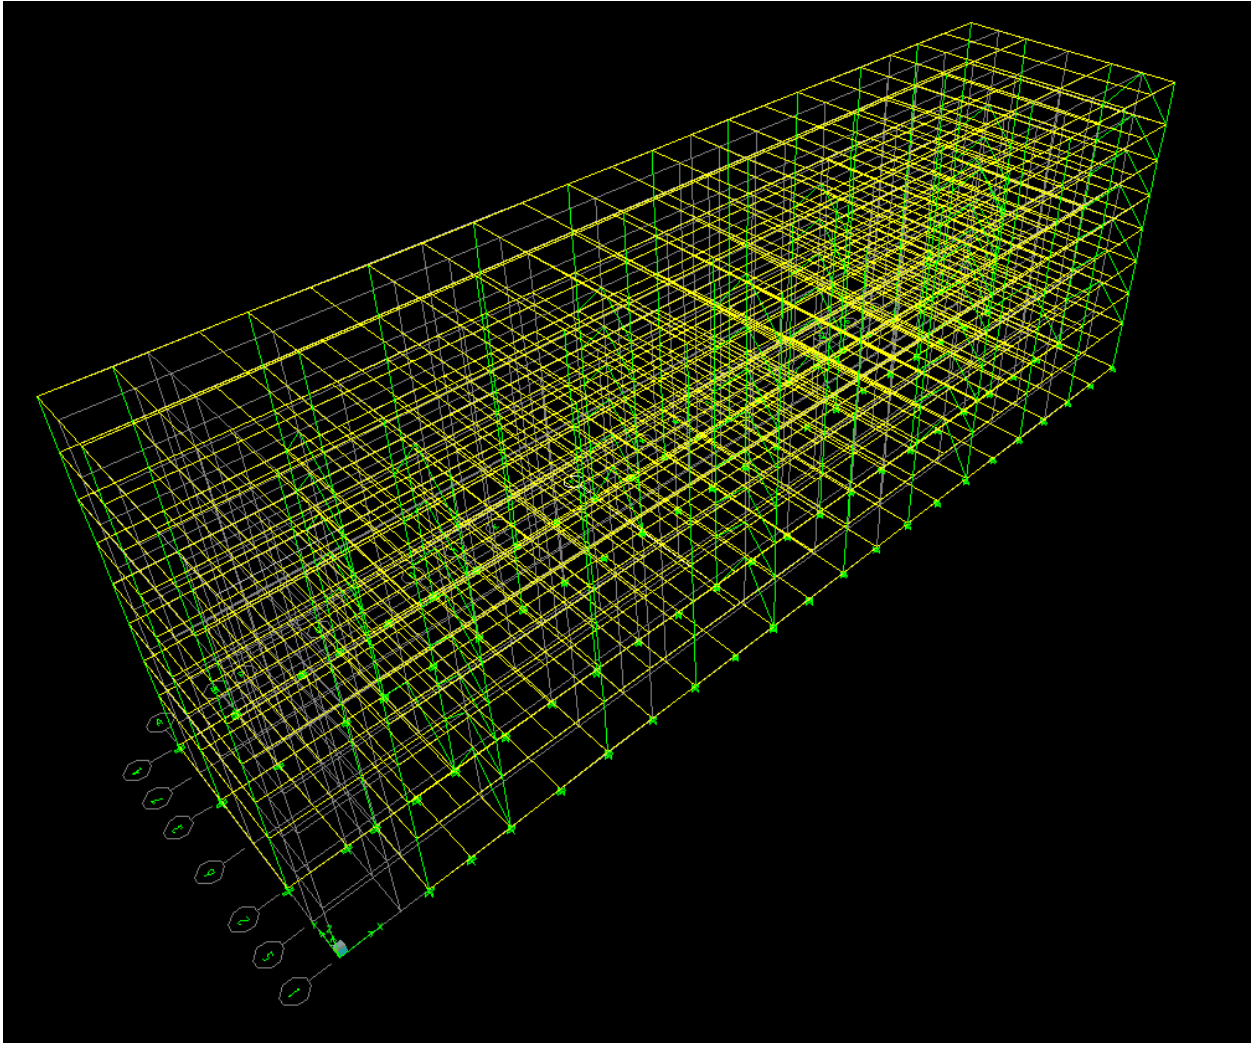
Existing Braced Frame and Moment Frame Lateral System
